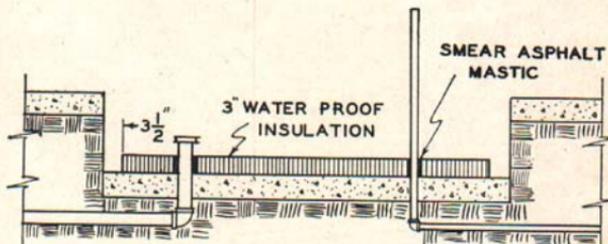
Step No. 2. Here the 3" water-proof package insulation has been placed on the cement floor. Note that a 3 1/2" space is left all around the insulation for the concrete wall. The insulation should be arranged as shown in Fig. 4 (below).
